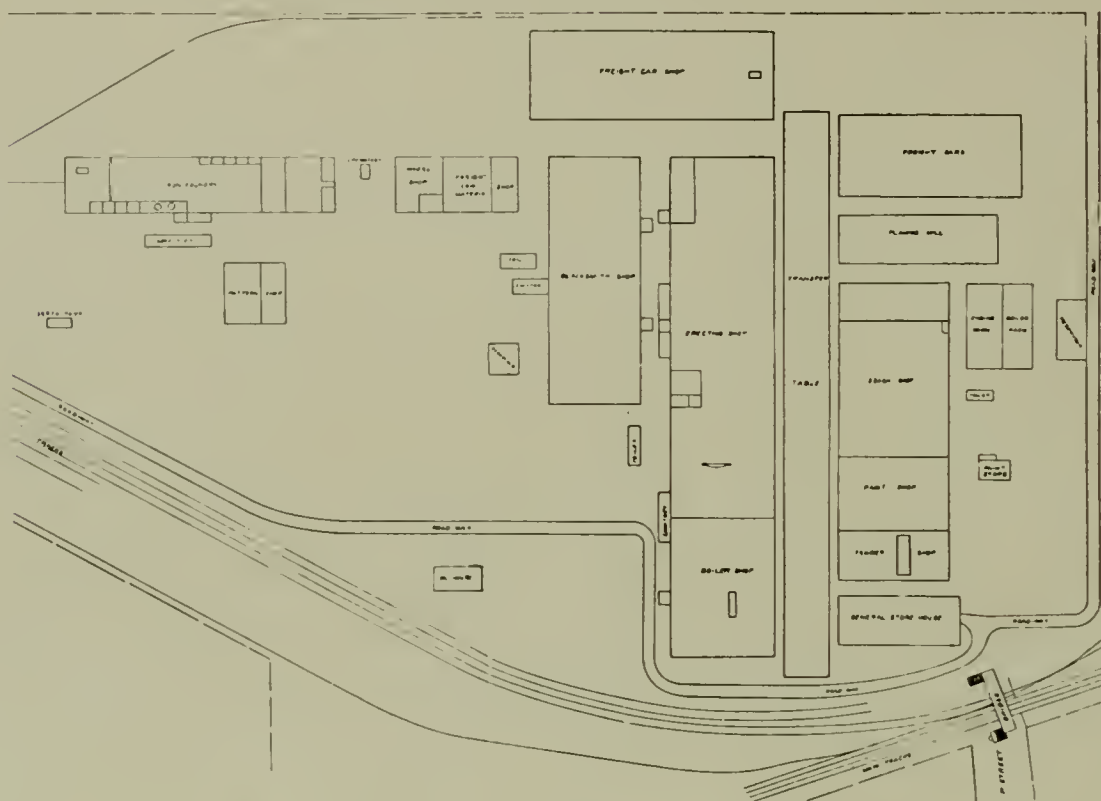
GROUND PLAN, SHOWING THE ARRANGEMENT OF BUILDINGS OF THE LOUISVILLE & NASHVILLE RAILROAD SHOPS. THE MOTOR-DRIVEN TRANSFER TABLE IS SHOWN IN THE LOWER RIGHT-HAND CORNER
